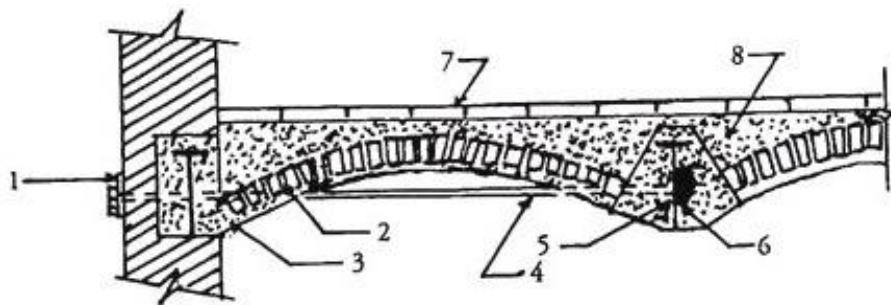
Jack arch roof: 1. M.S. plate 10 mm thick; 2. Brick arch; 3 Plaster; 4. M.S. Tie rod; 5. R.S.J.; 6. Cement concrete; 7. Flooring; 8. Lime concrete (Bothara and Brzev 2011).
